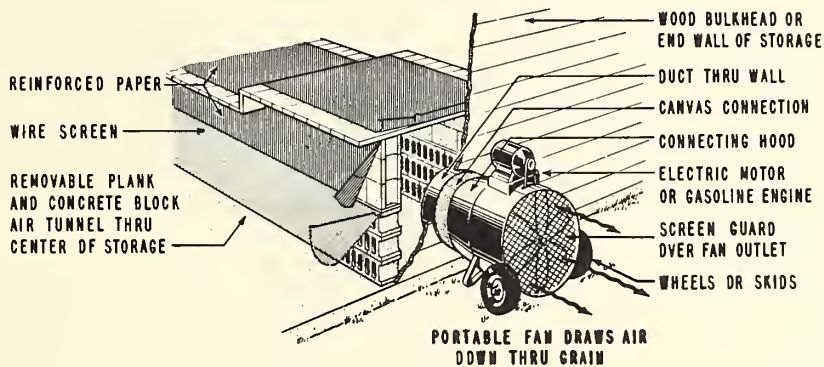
Cooling fan connected to flat storage structure equipped with tunnel constructed with concrete blocks, boards, and window screening.
